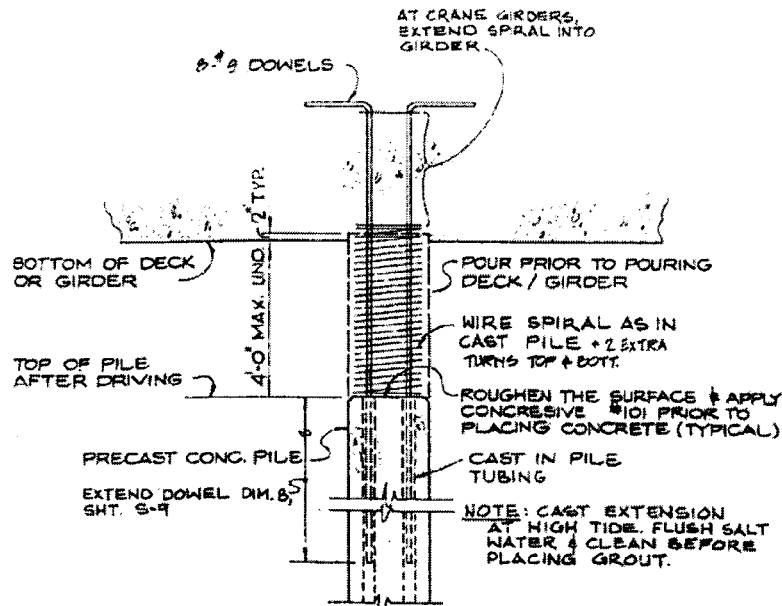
Typical Pile Extension Detail from Port of Oakland Wharf, Berth 30
